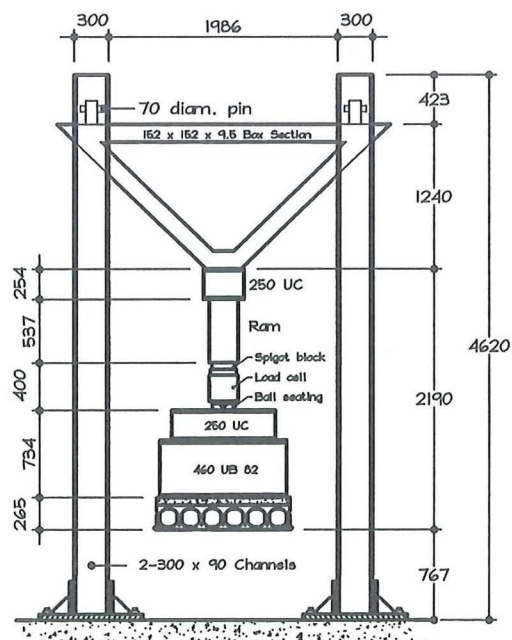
(b) End elevation of loading carriage and hollow core section
